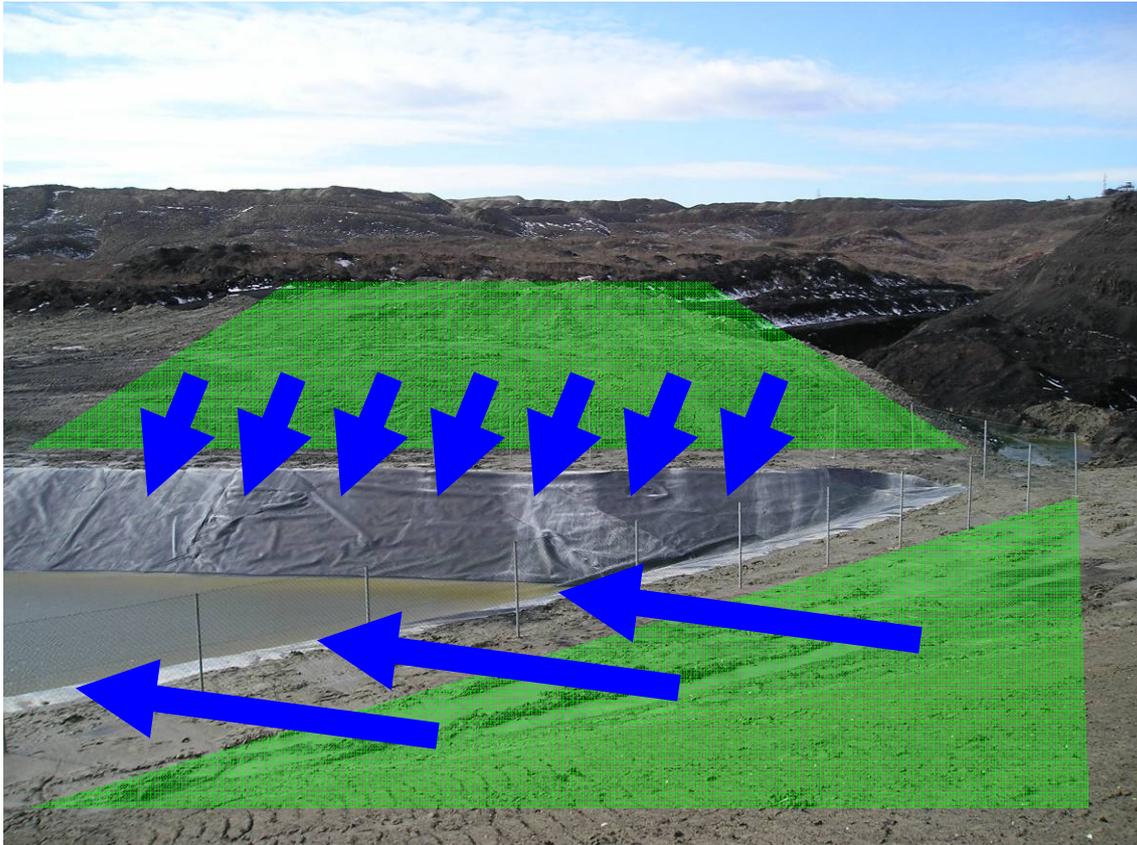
Pristina landfill*, view leachate pond (about one fifth of the entire structure visible):
